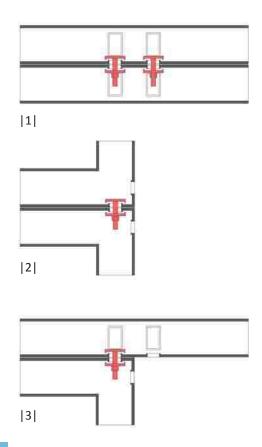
Frame Connections based on connection Points |1| Mid-span connection, |2|corner-to-corner connection |3| corner-to-mid-span connection
